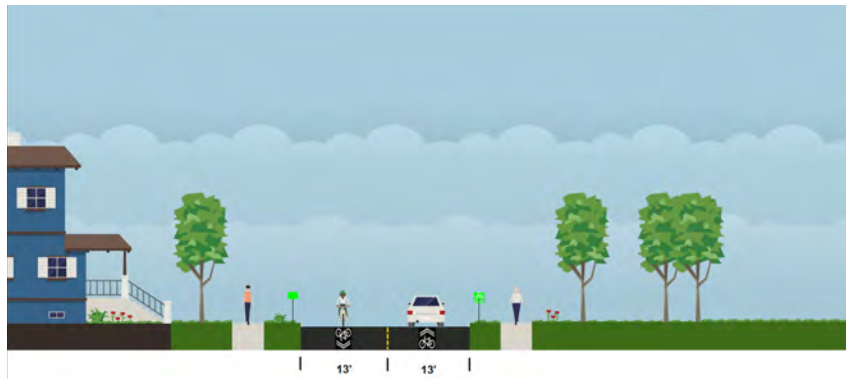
Proposed Cross-section: Park Street at Highland Avenue Sharrows and Traffic Calming Concept
